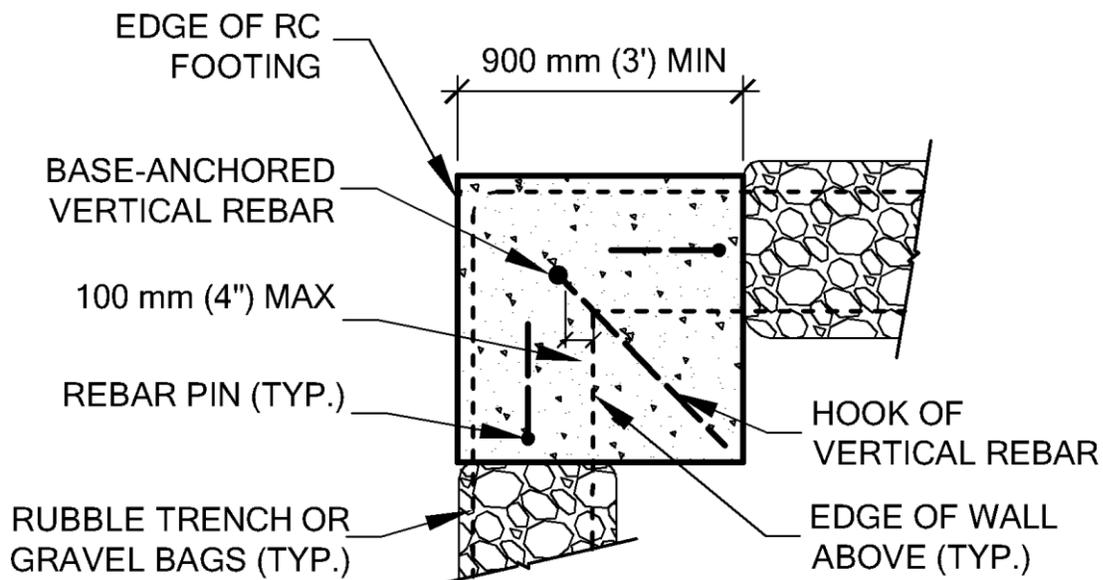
Spot footing to anchor long vertical rebar extending to the bond beam.
